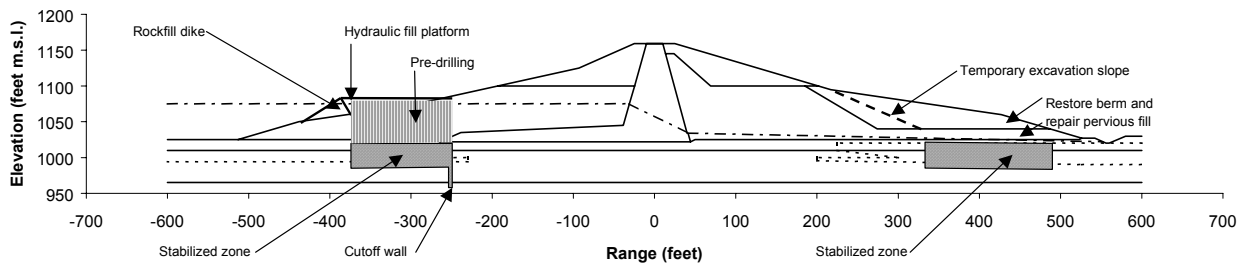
Conceptual sketch of foundation soil stabilization.
